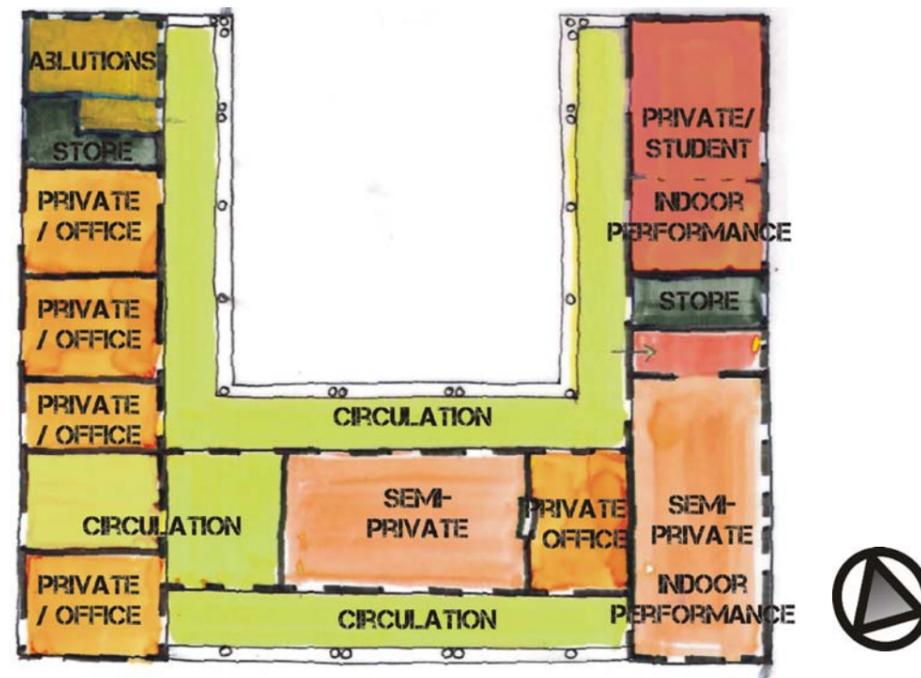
Spatial configuration sketch of the first floor of the Drama Building.
